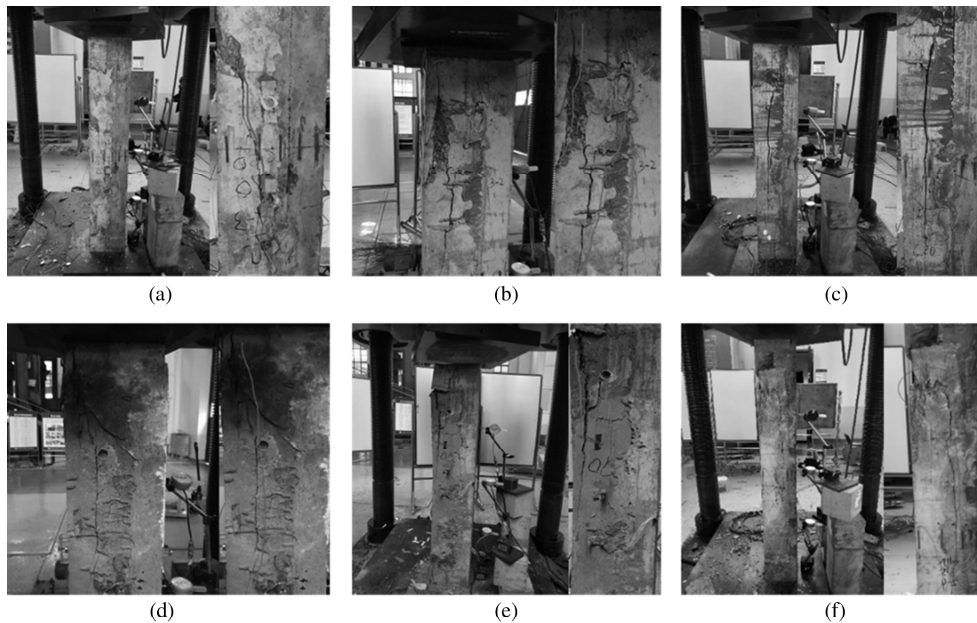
Photographs of the failure modes of different concrete column specimens: (a) specimen C; (b) specimen D; (c) specimen E; (d) specimen F; (e) specimen G; and (f) specimen H.
